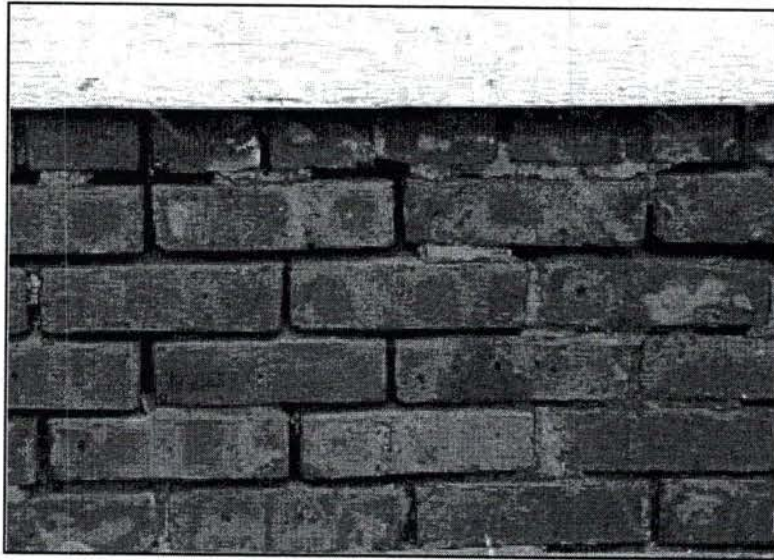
Open joints in the brick foundation of the southern elevation of the rear ell.
